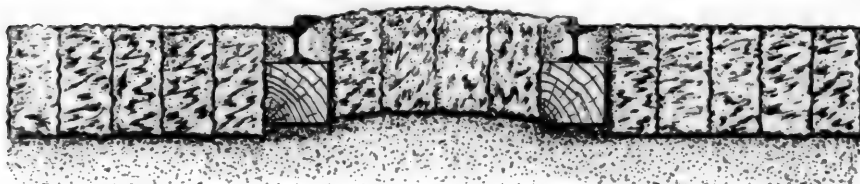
Johnson patent rail with longitudinal wooden ties.
